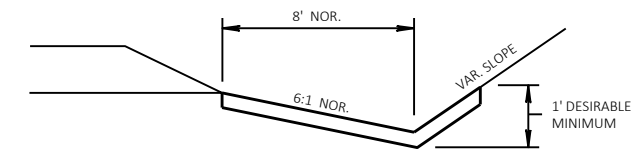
DETAIL FOR EXCAVATION BELOW SUBGRADE
